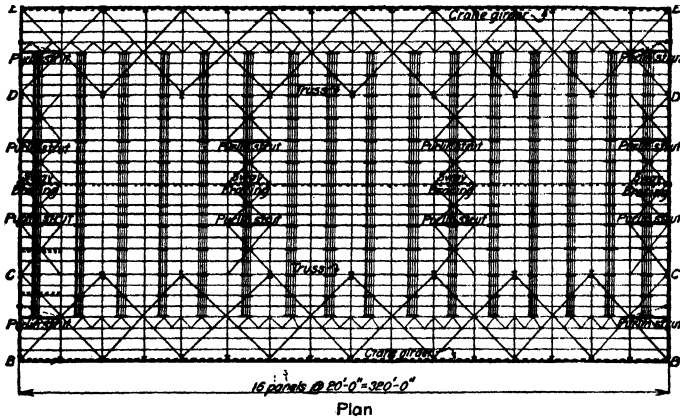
Machine shop. Plan of skylights and roof bracing.
